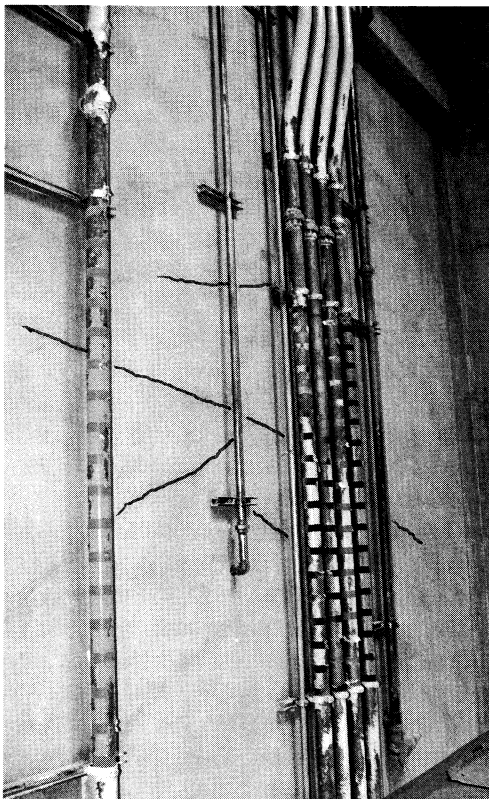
Typical cracked wall highlighting major cracks; the pipelines remained in place during the retrofit (Courtesy of External Reinforcement Inc.)
